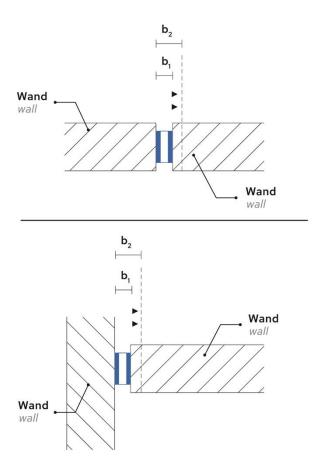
Vertical wall joint construction. The maximum lateral expansion. (b1 to b2) is 20 mm.
